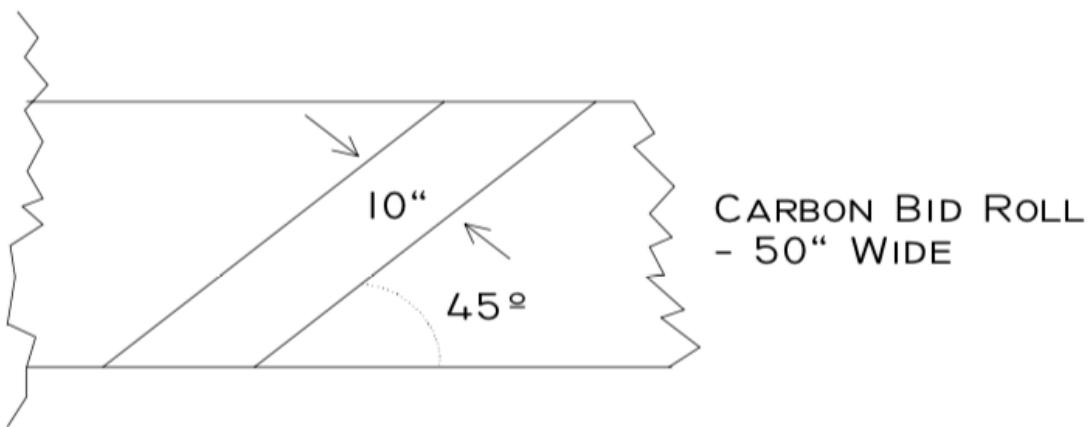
Cutting Carbon Torsional Lay-Up Strips
